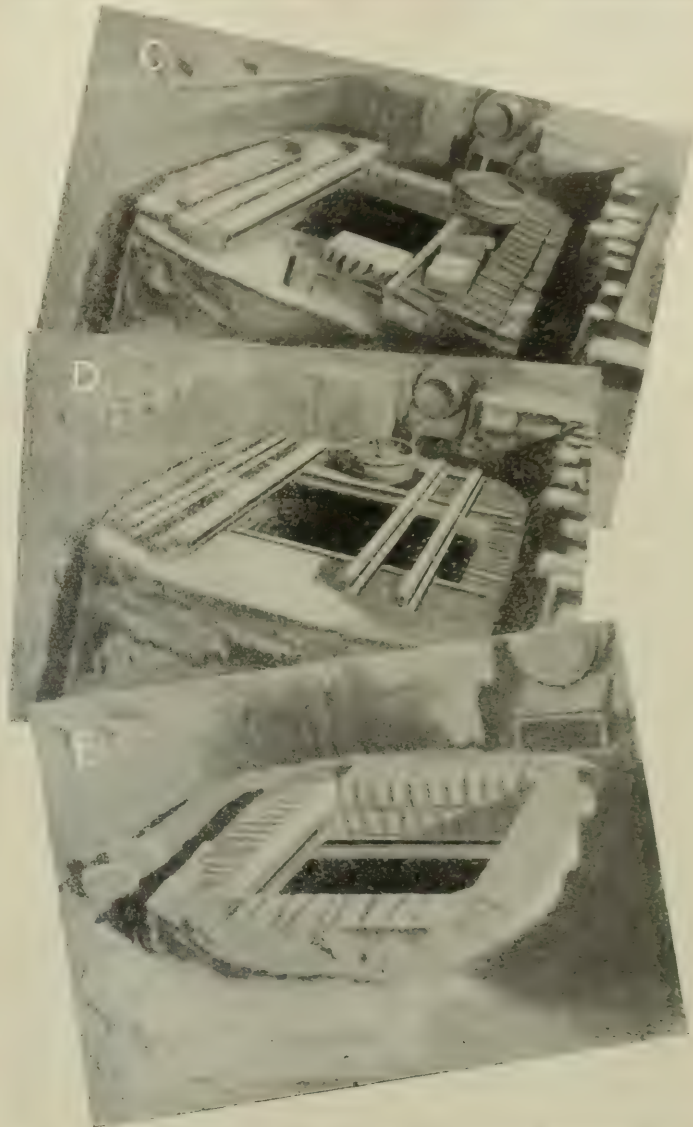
A.—LAST COURSE FOR RAIL ROOF. C, SETTING MASONRY; D, RAILS IN PLACE; E, READY FOR COVER.
